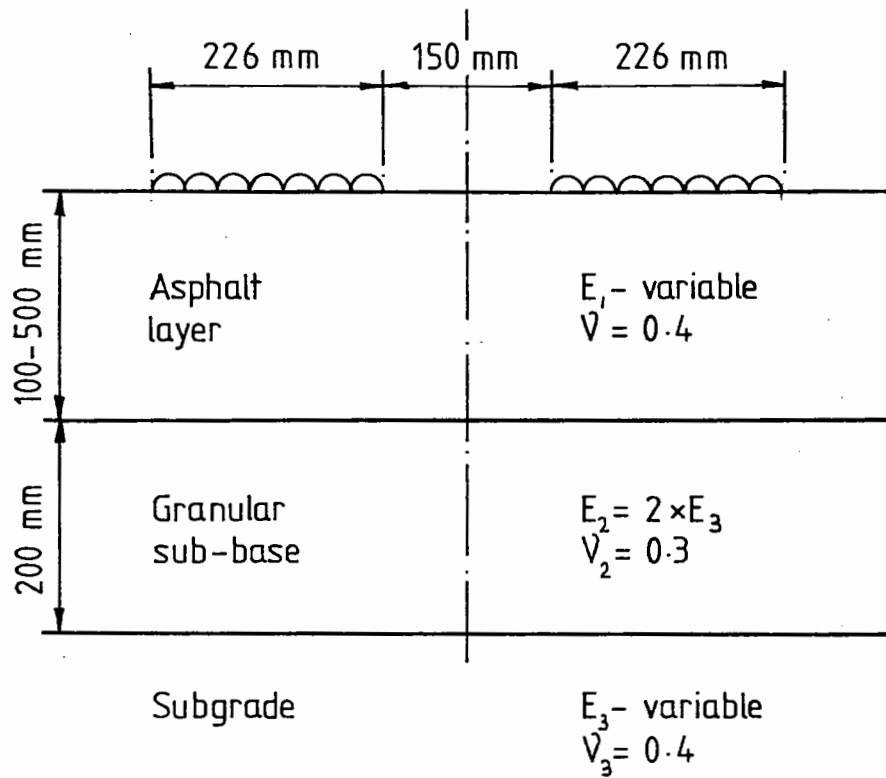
PAVEMENT STRUCTURE FOR SIMPLIFIED DESIGN METHOD
